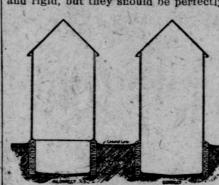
Correct and Incorrect Methods of Constructing Silo Foundations.
